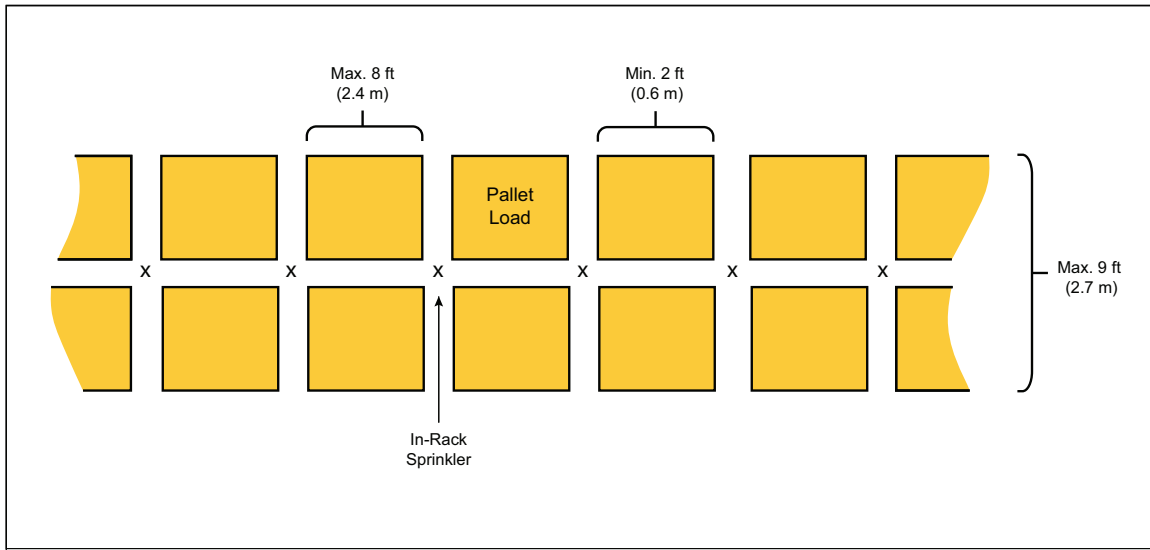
Plan view of IRAS(E) horizontal in-rack sprinkler arrangement for double-row racks having a maximum depth of 9 ft (2.7 m)
